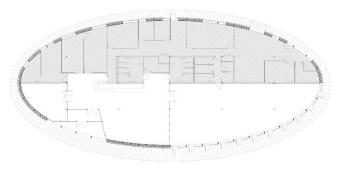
image illustrating the building's floor plan – internal spaces, (online). 2018.
